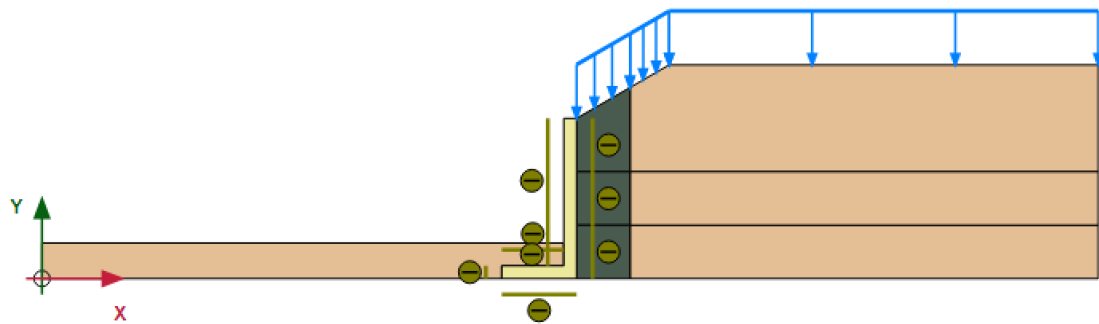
Retaining wall with backfill slope 30° and 1.5m TDA backfill
